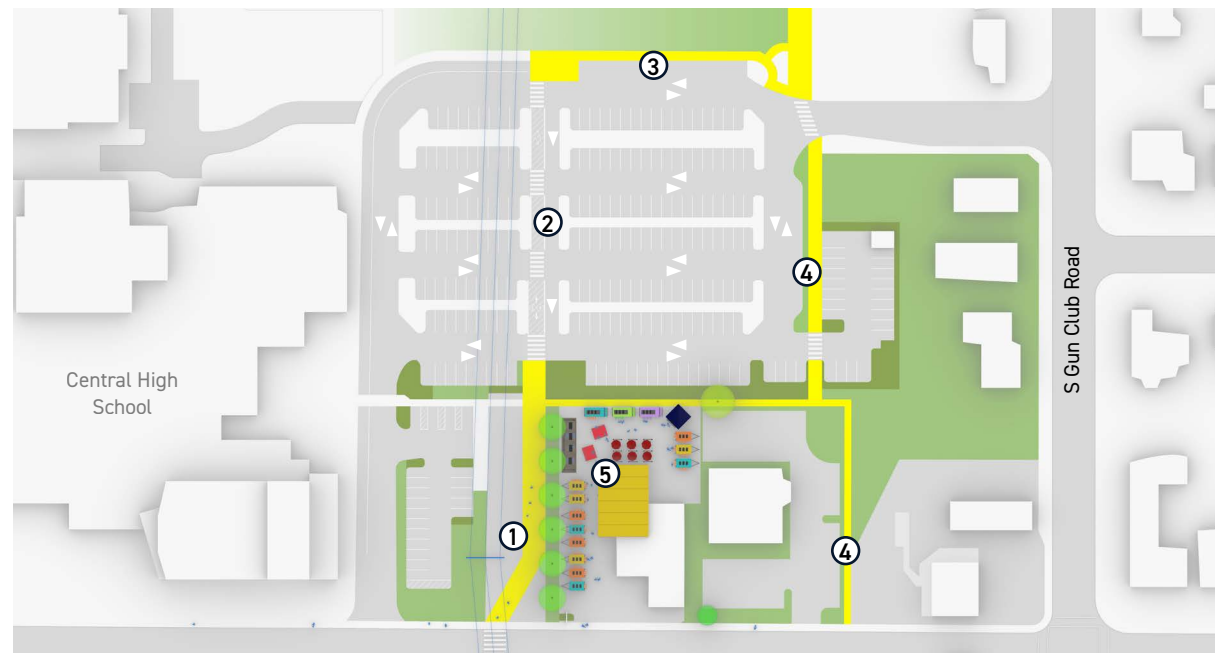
Ash Creek Connector at Central High School East Parking Lot
